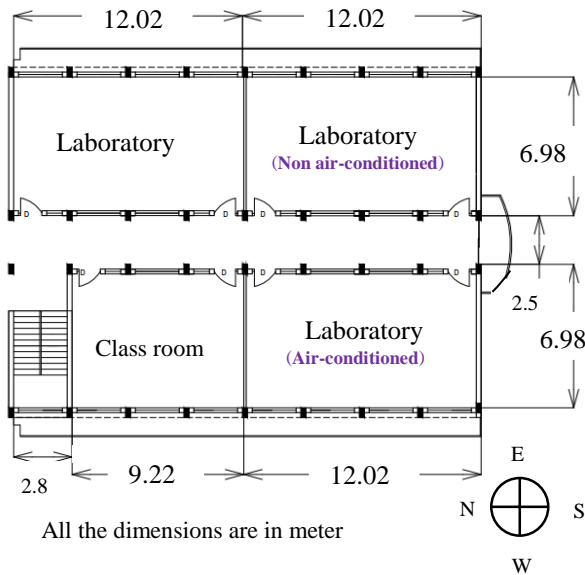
Layout of southern part of Block-C (4th Floor), New Academic Building, KUET.
